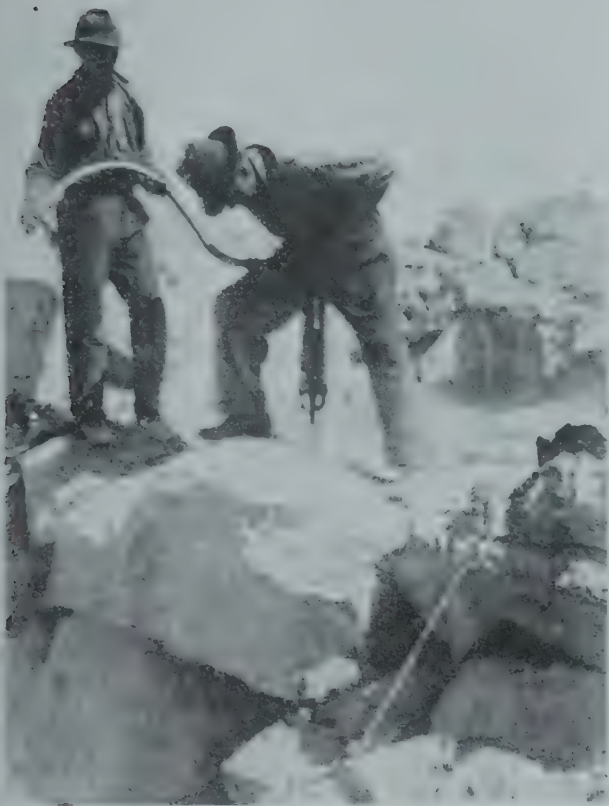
Use of mechanical drill and explosives breaking down the blocks. (This work was formerly done by hand, with hammers).
